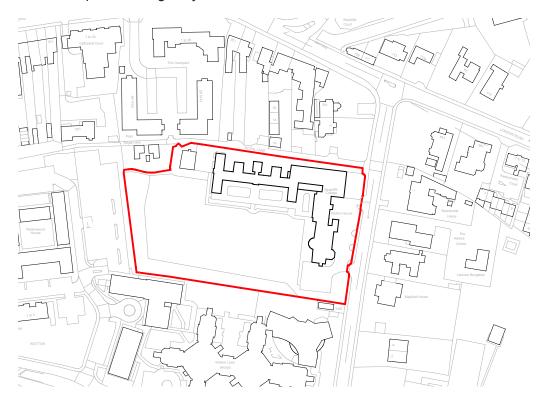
Site Location Plan: Denoted via Red line Boundary.
